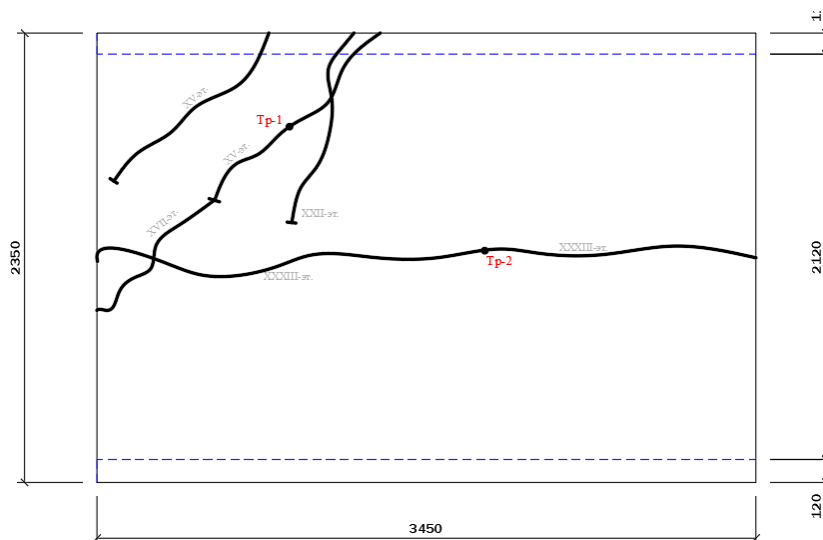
Diagram of cracks in the interlocking floor slab
